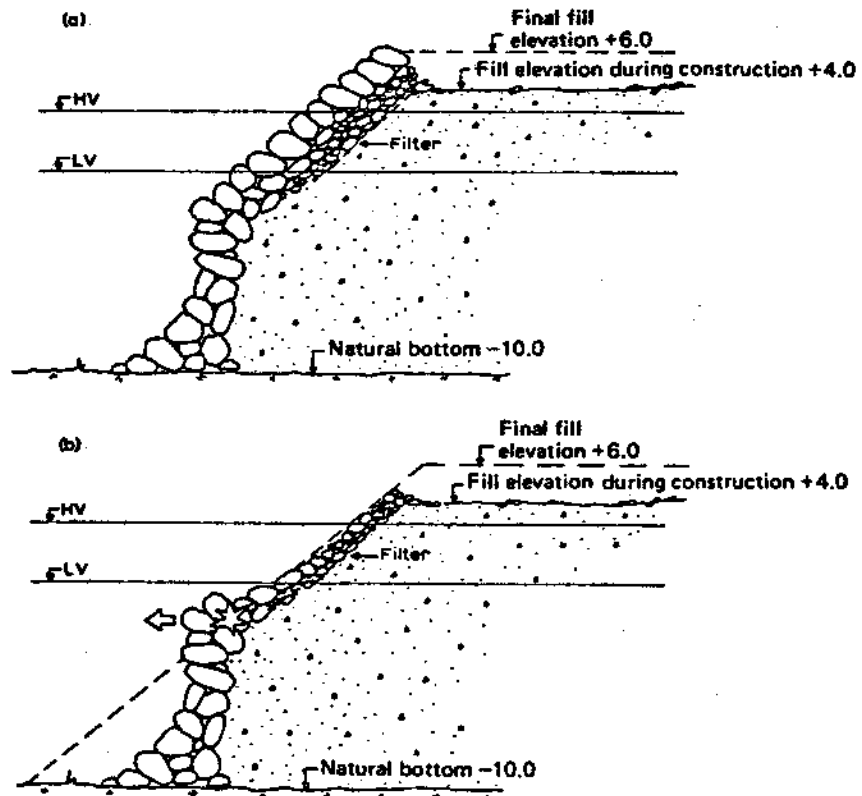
Down-Blasting of Steep, Unstable Rubble Slope Below Water Level (Bruun and Kjelstrup, 1981, p. 190)
